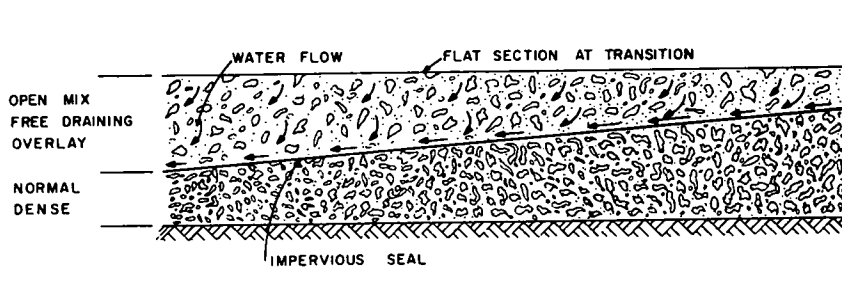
Pavement cross section at transition from tangent to superelevated curve (flat section, no surface cross slope).
